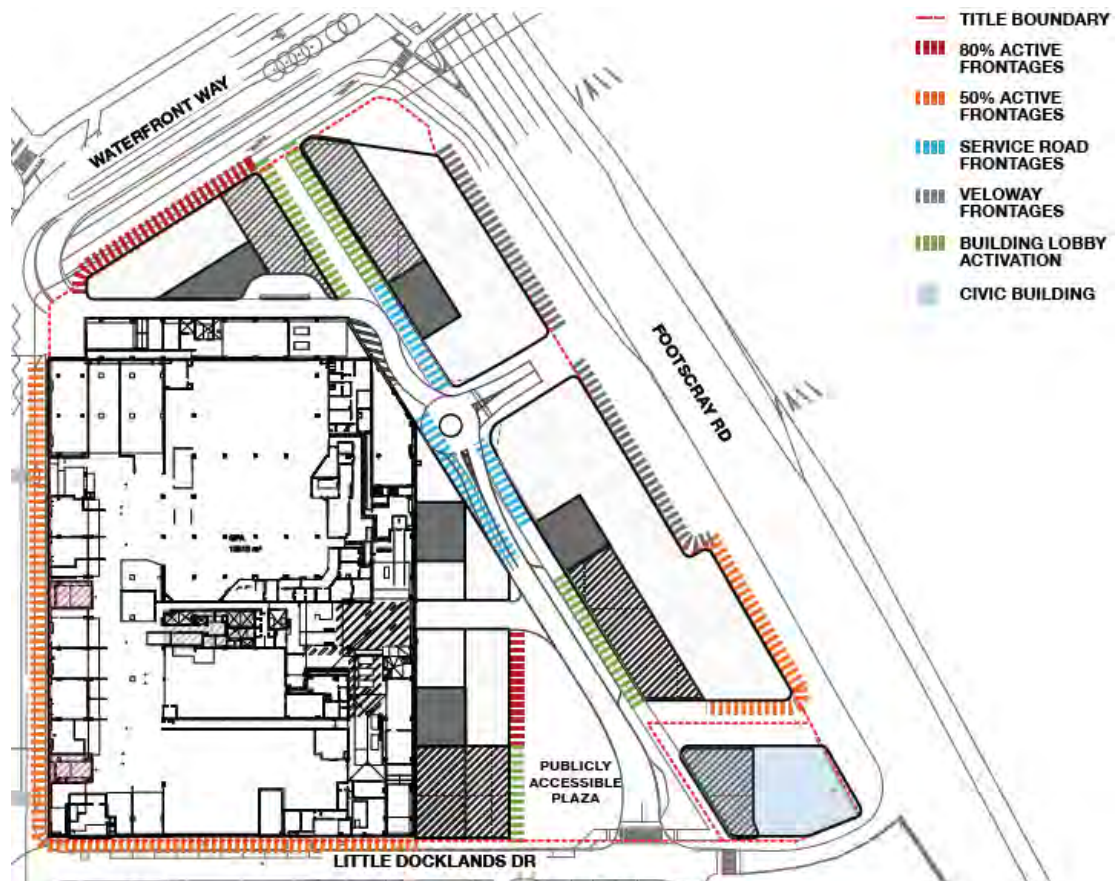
Concept Plan 3 – Ground Flor Public Realm Activation
